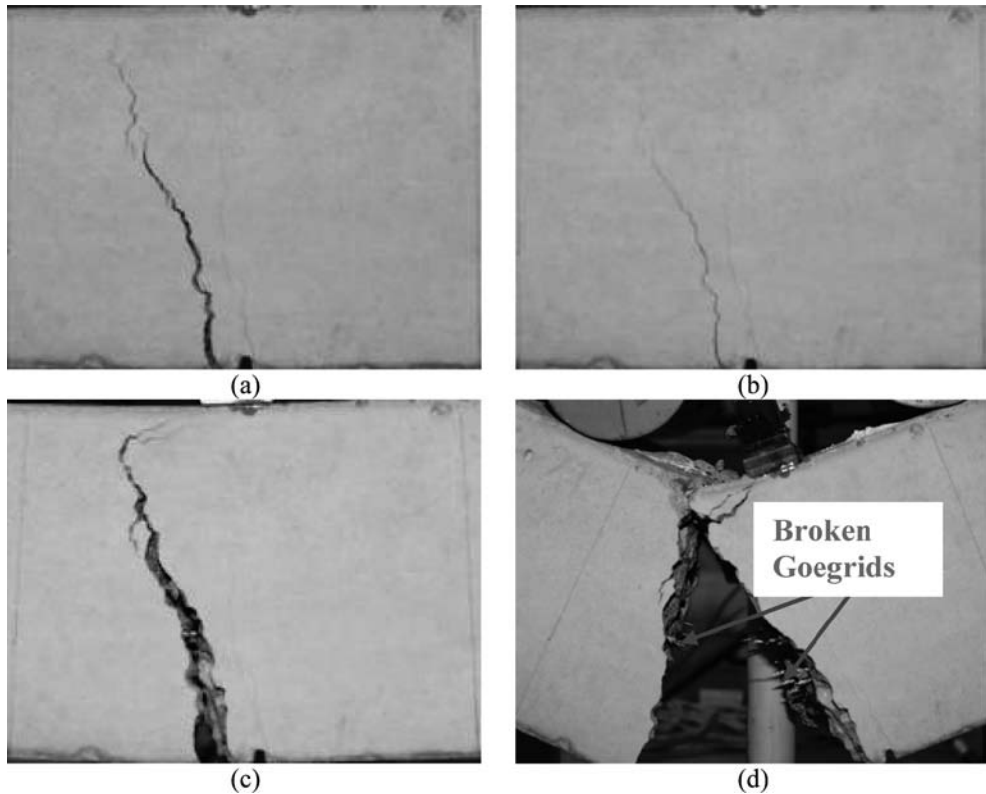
Failure mode of concrete beam reinforced by Grid B: (a) Crack initiation; (b) Crack propagation; (c) Crack with large CMOD; (d) Failure.
